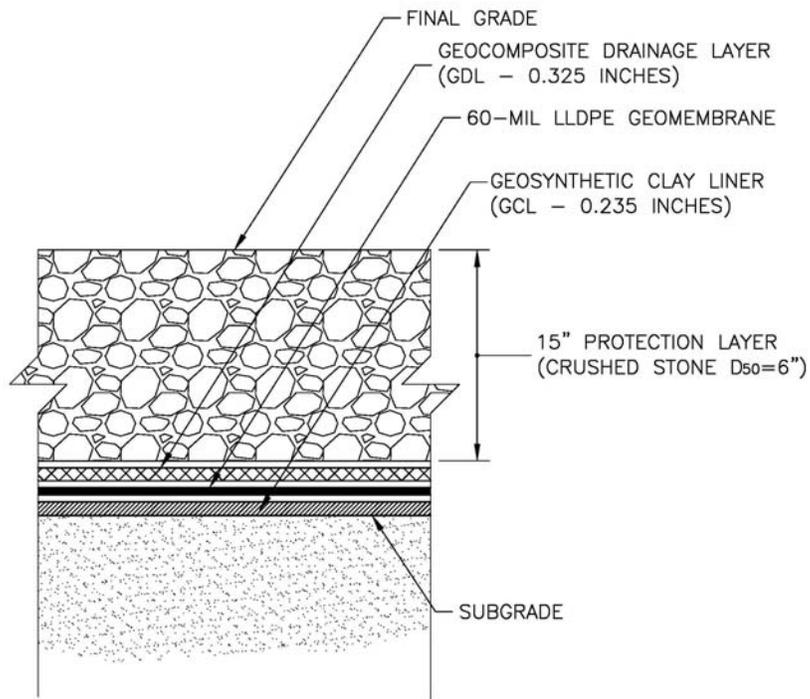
Proposed Tailings Impoundment Cap Cross Section
